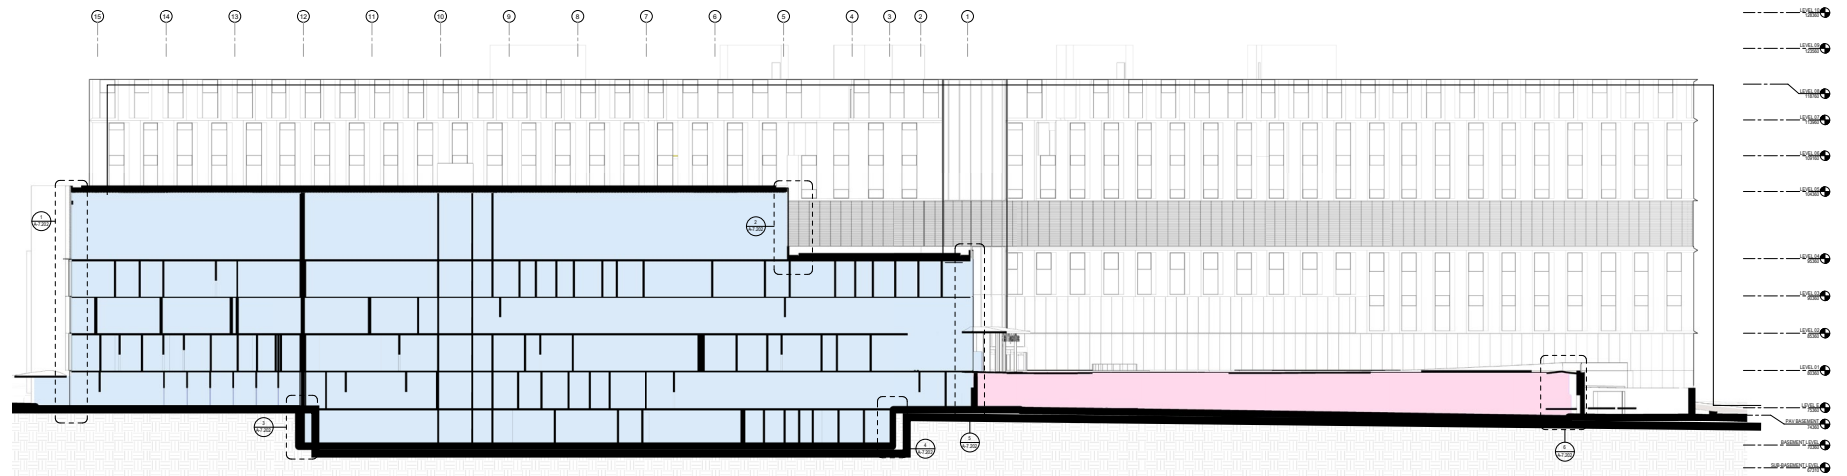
Hospital Section Through Central Podium with Tower A beyond
